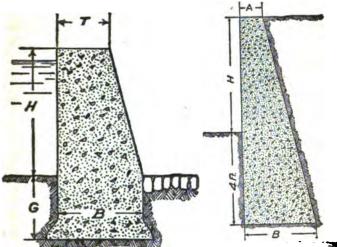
Section Showing Design Fig. 34. Section Showing of Concrete Dam.
